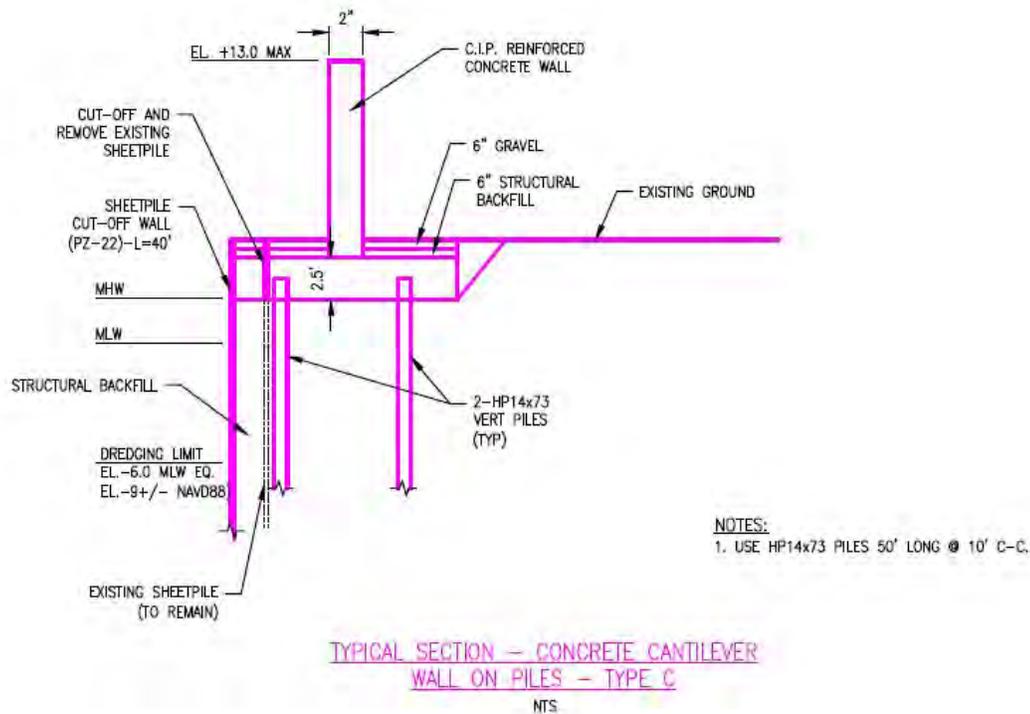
Typical Section – Concrete Cantilever Wall – Type C
